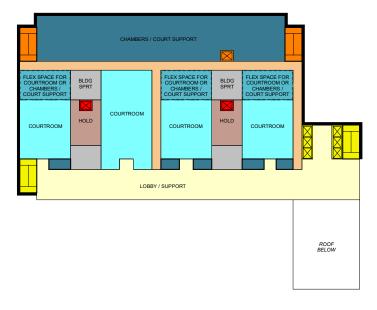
Option 5 - Compact Layout with 4 courtrooms on a typical floor
